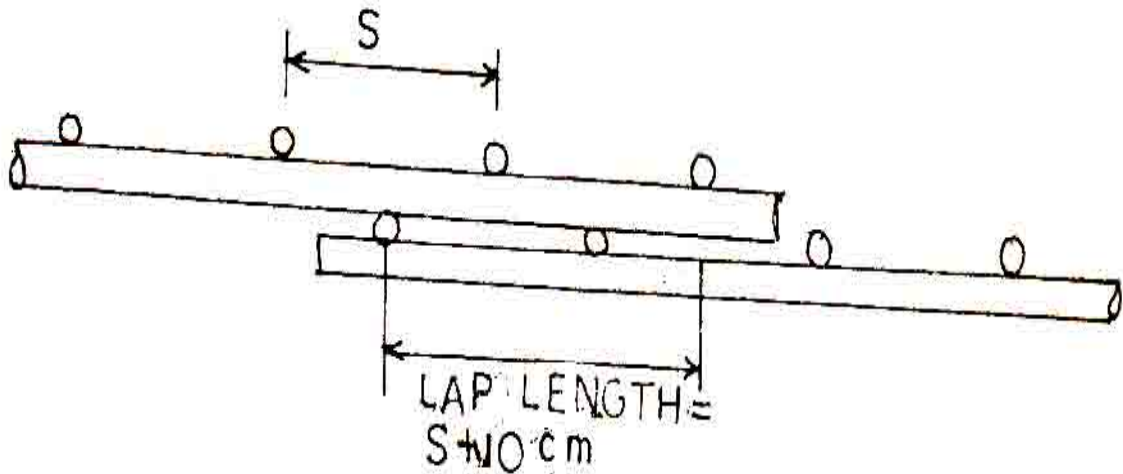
LAP SPLICING OF WELDED WIRE FABRICS
